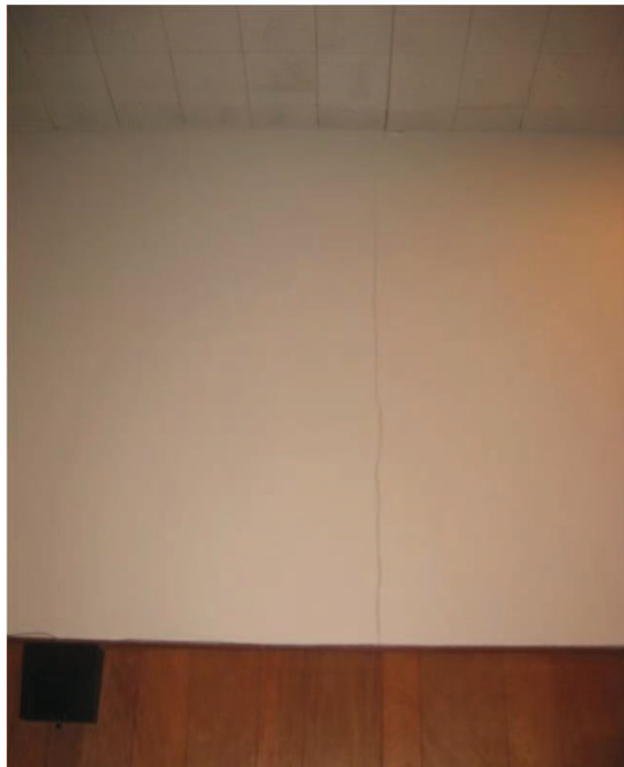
Plaster crackage at south wall of auditorium.
